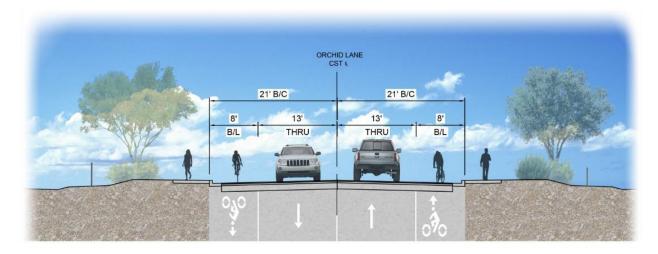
Orchid Lane Typical Section - Segment H3 Standard Bike Lanes/No Parking
